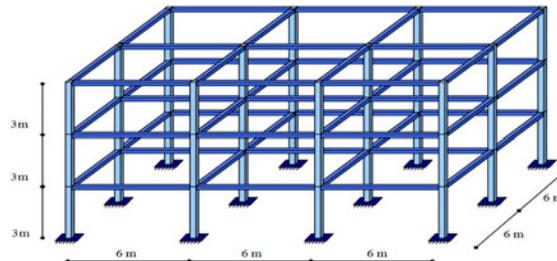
Geometry of 3D, 3-storey reinforced concrete frame structure.
